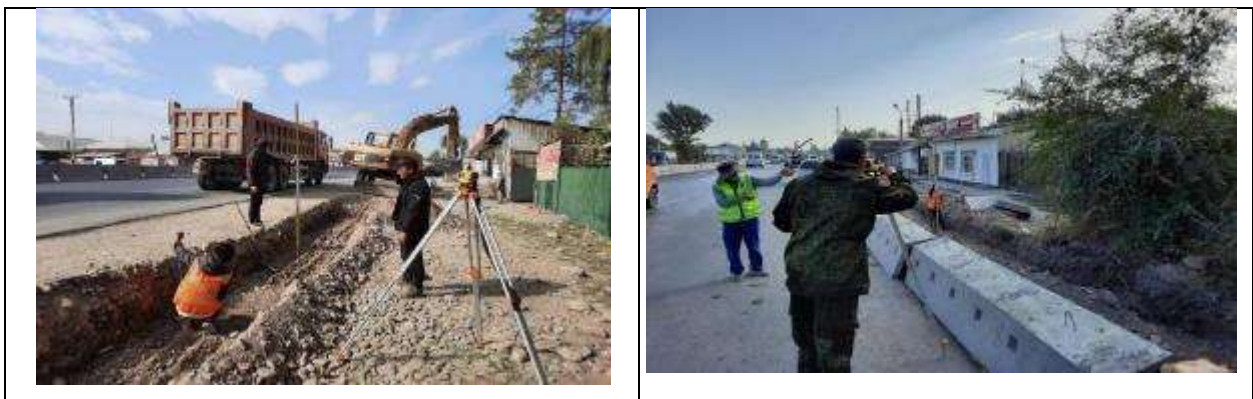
Installation of roadside ditches and crossings to private houses and streets adjacent to the road in the Alexandrovka village.
